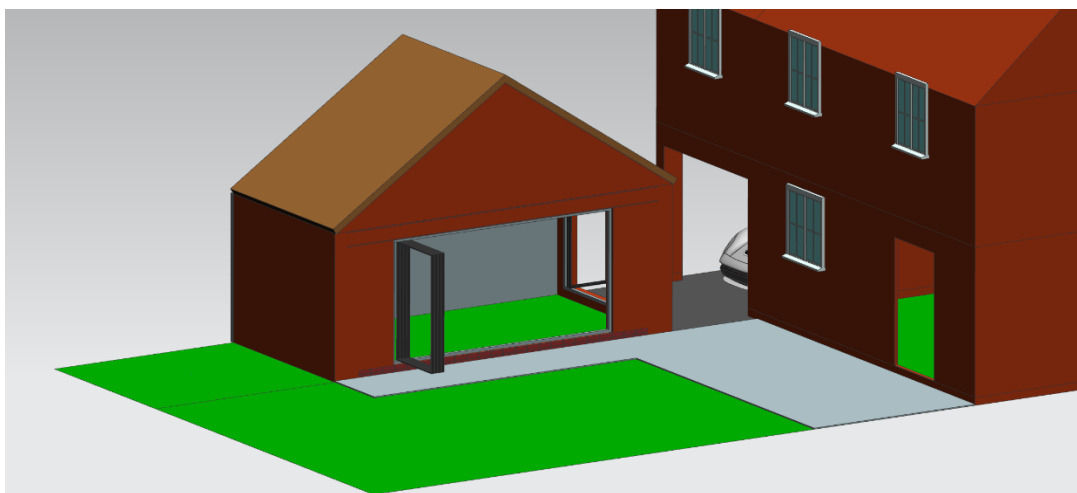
Garage wall cutout 3D representation with bi-folding doors installed
